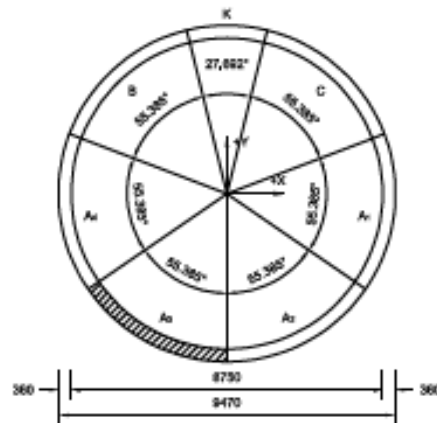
Cross section of the tunnel ring, analyzed segment highlighted
